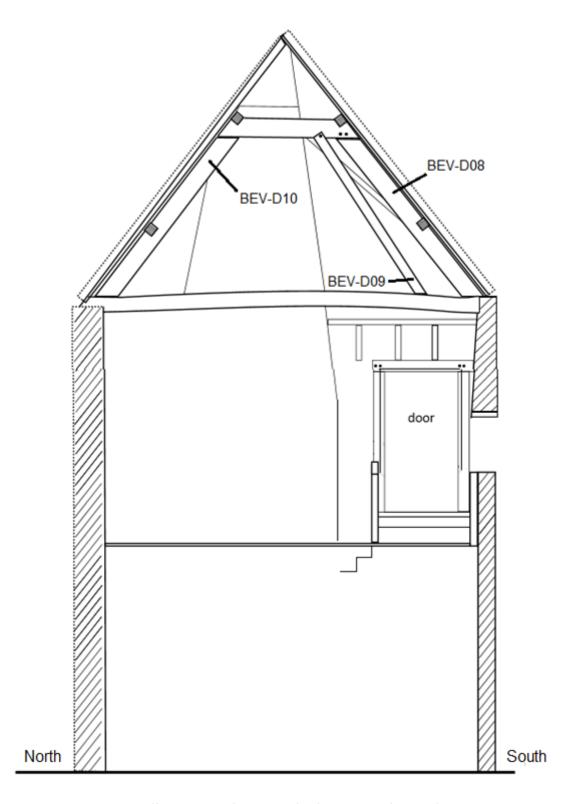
Great Hall, truss 1, showing the location of sample BEV-D08–10 (after YVBSG 2015)
